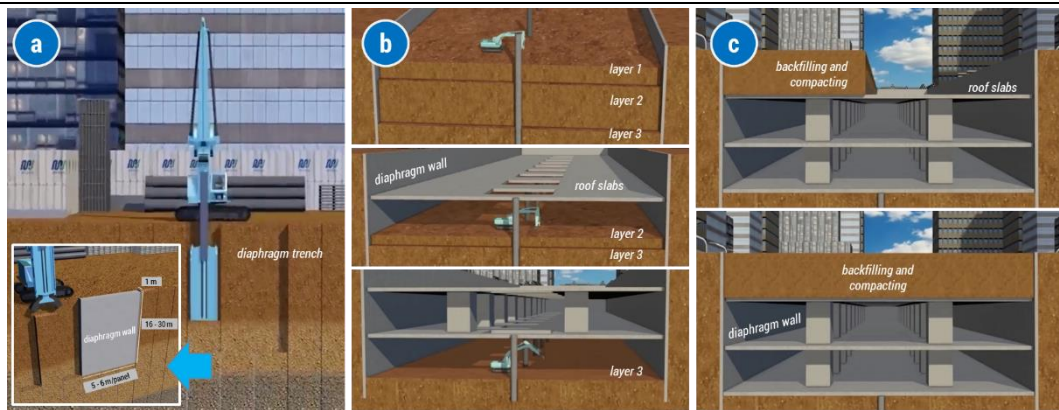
Illustration of Earthworks for Underground Station Construction
